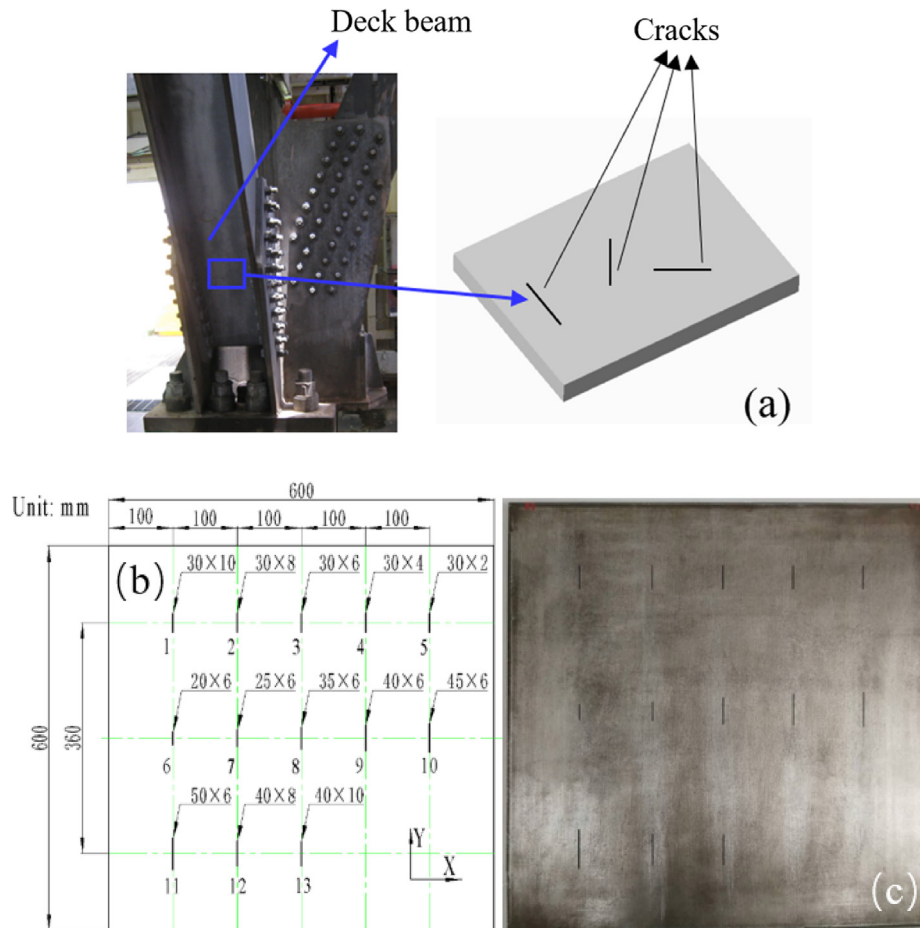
(a) Schematic picture of the cracks on a deck beam. (b) Workpiece design. (c) Top view of the workpiece.
